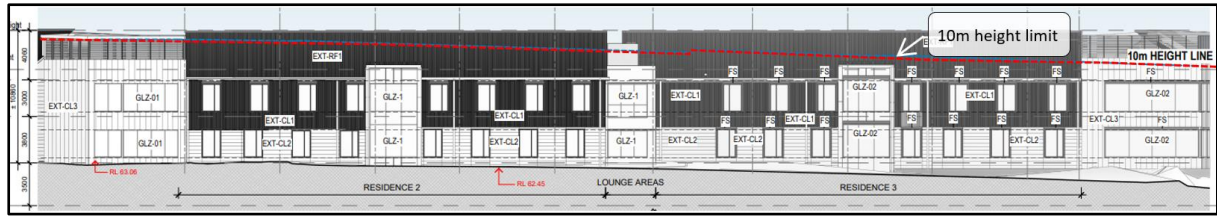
| Residential Pavilions 2 and 3 south elevation (Source: Applicant's SRtS)
